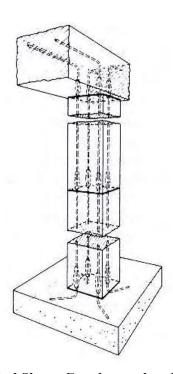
NMB Grouted Sleeve Coupler used on Precast Bridge Bent [2.4]
